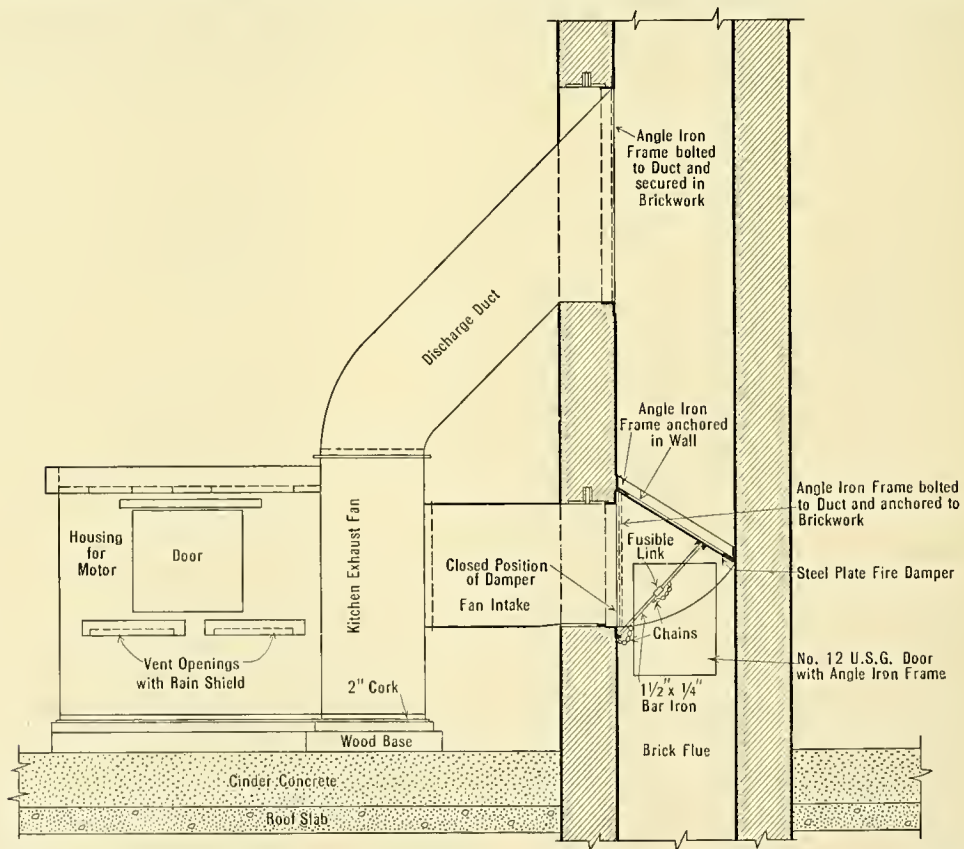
Arrangement of fan, vent stack and safety damper of ventilating equipment for a kitchen
